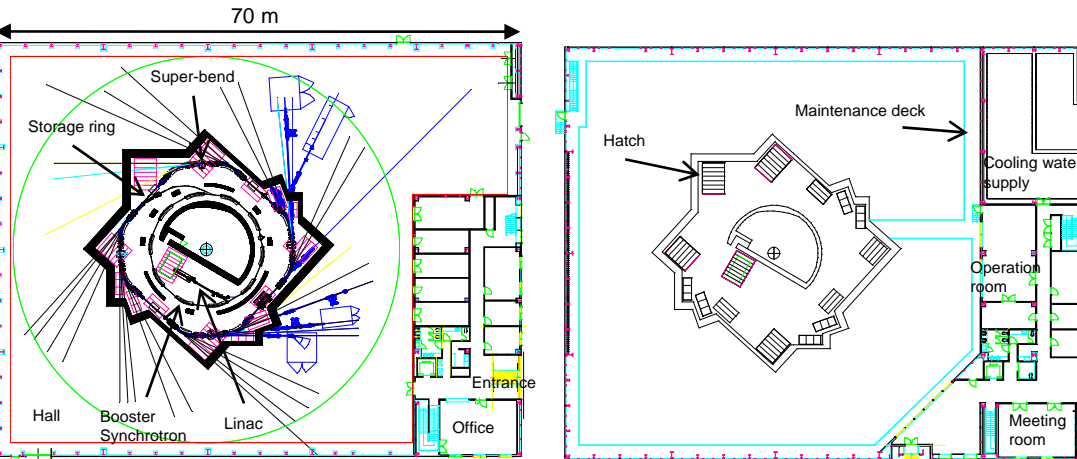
Floor plan of the facility. 1F (left) and 2F (right).
